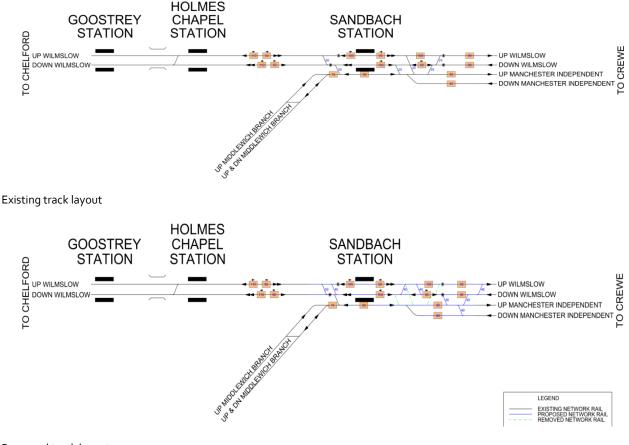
Schematic diagram of existing and proposed track layout at Sandbach Station
